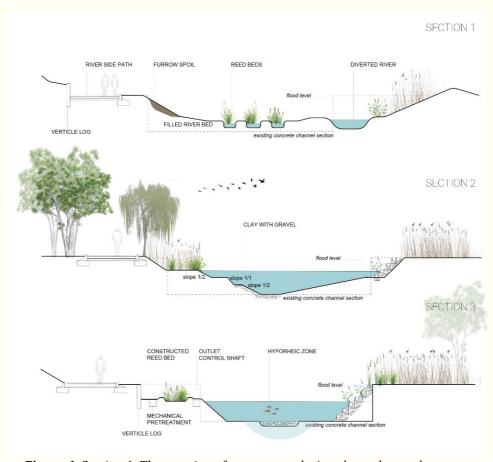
Section 1: The creation of a new meandering channel to replace concrete weirs, Section 2: Full replacement of the concrete canal along river sections with a natural channel. Section 3: Partial replacement of the concrete canal with a hyperoic zone
